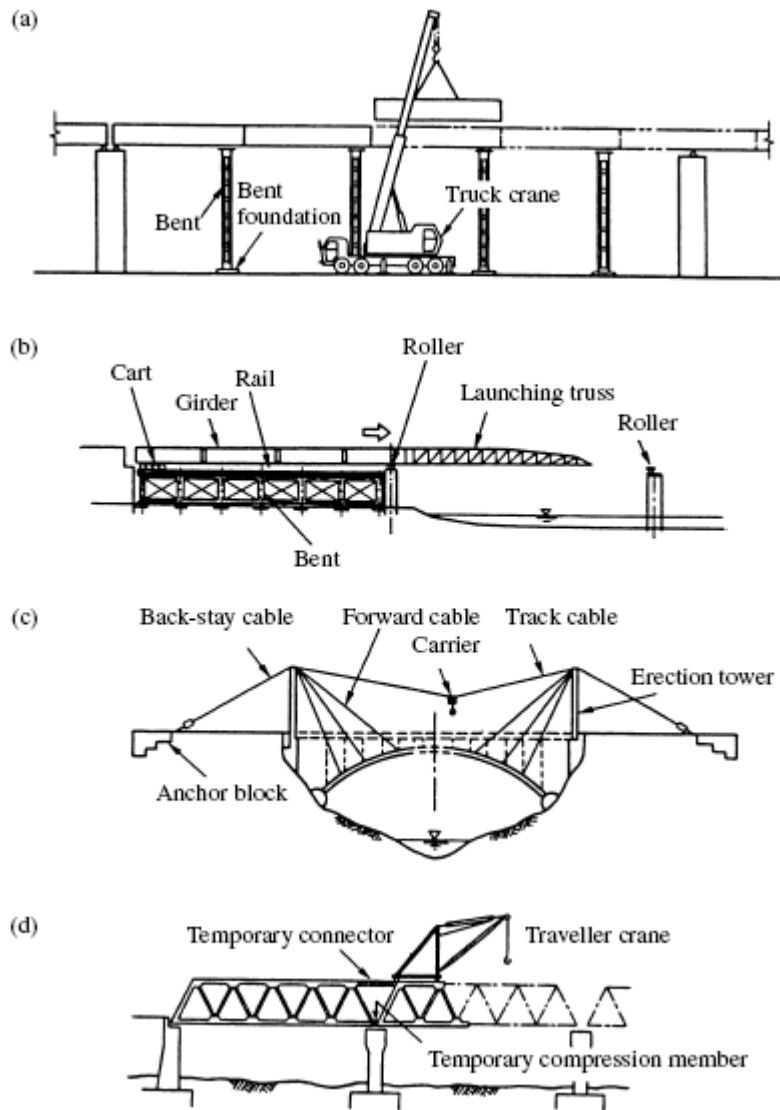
Erection methods: (a) crane erection, (b) launching truss erection, (c) cable erection and (d) cantilever erection
